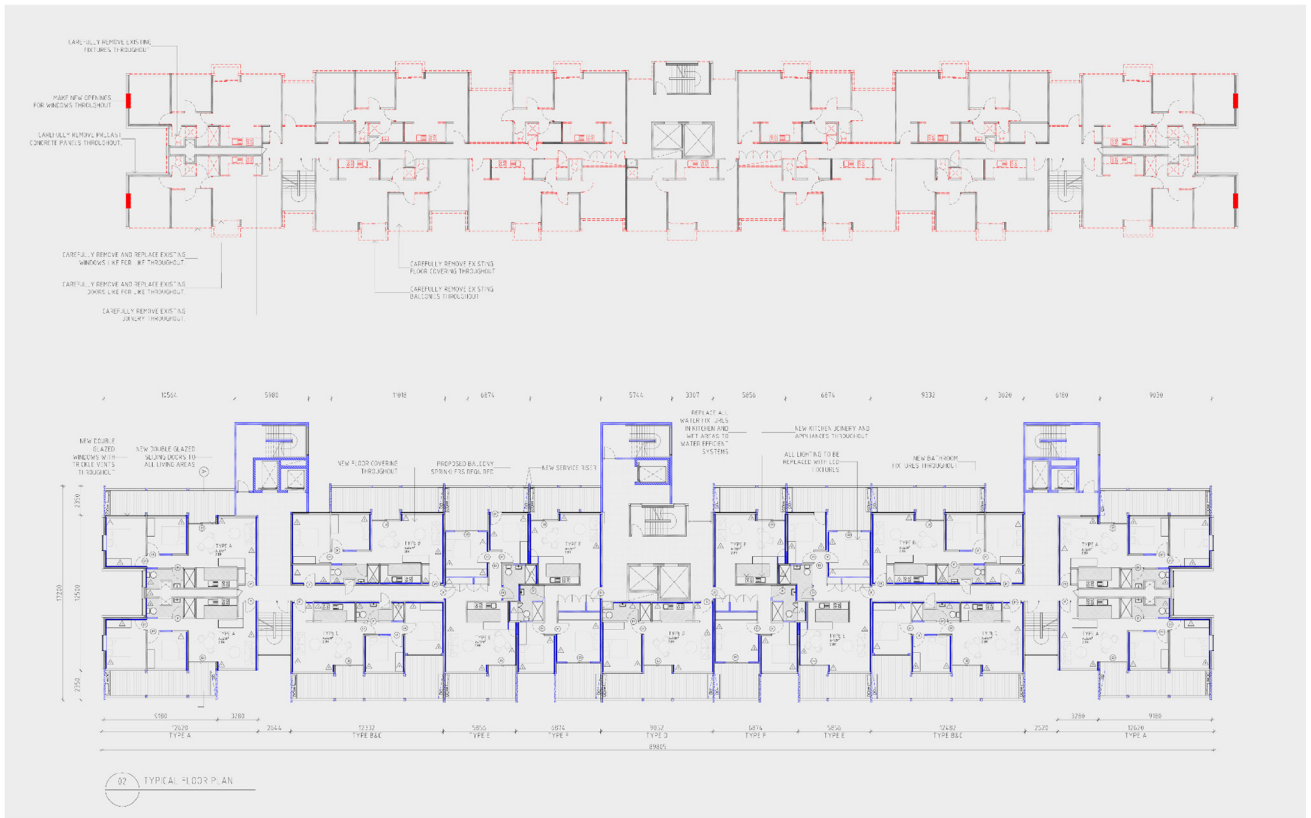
Typical plan showing the unit types for the refurbished block OFFICE
